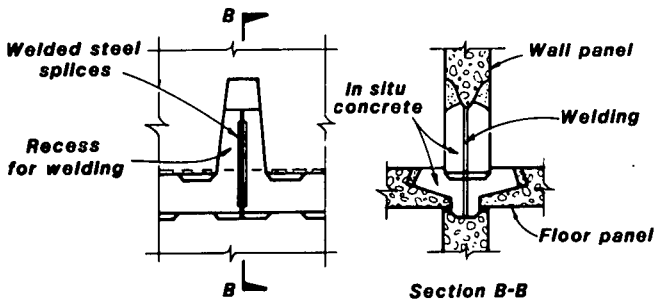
Typical Vertical Joints Between Prefabricated Large Panels.
